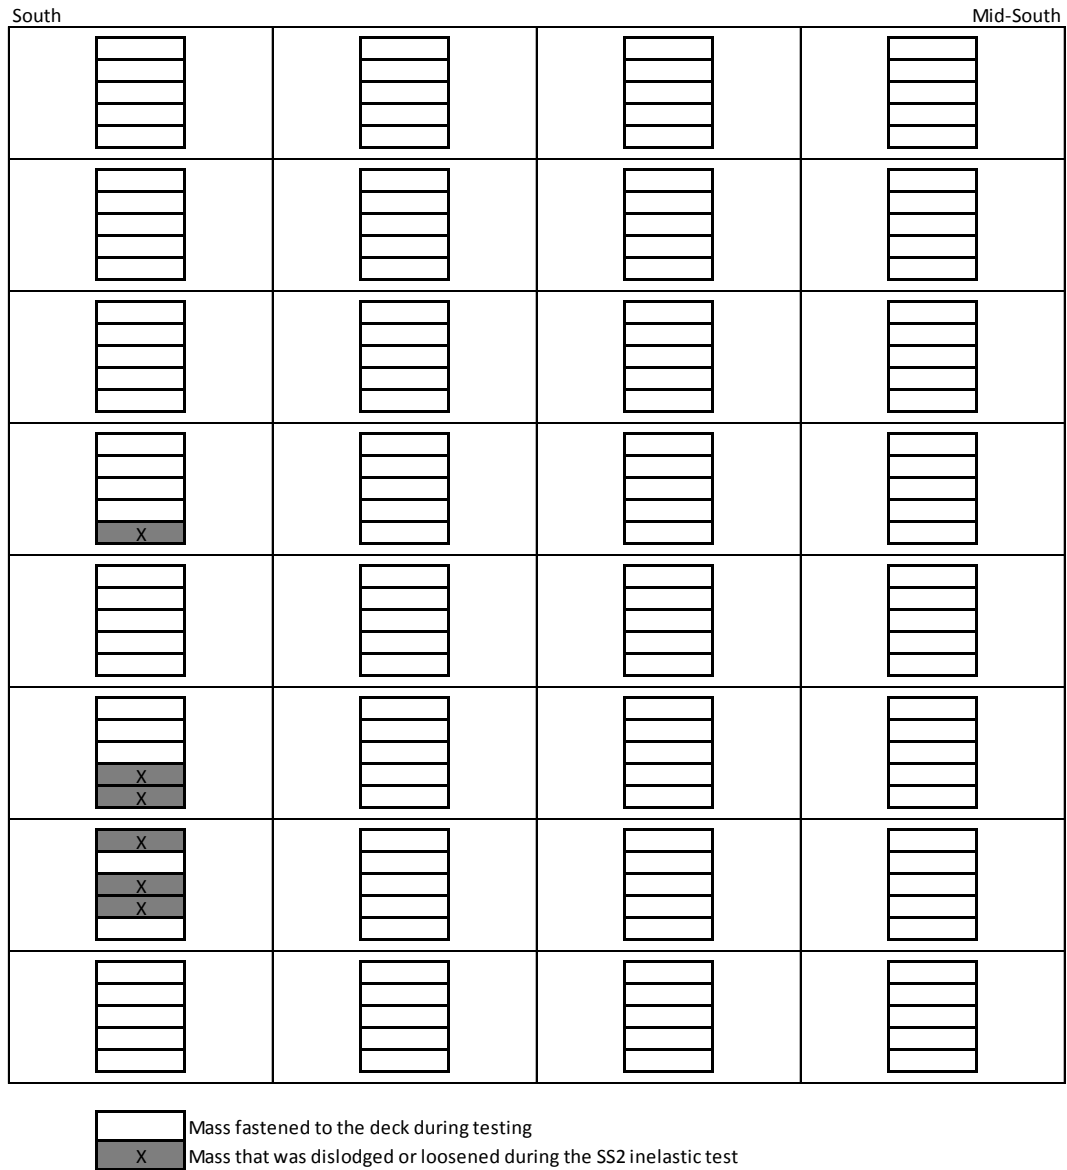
DIA13: Fastener failures during inelastic test (1/5)
